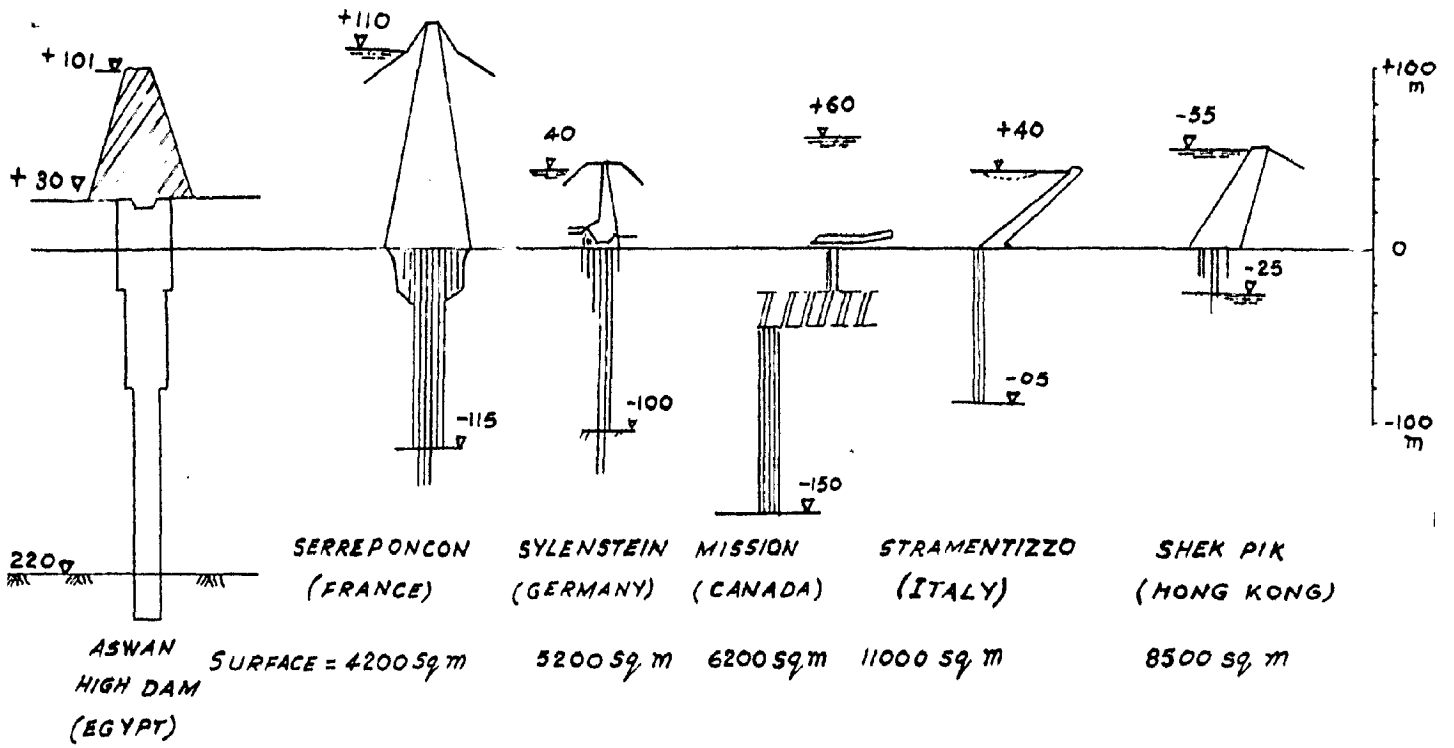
SHOWING GROUT CURTAIN IN ALLUVIAL SOIL FOR DAM FOUNDATIONS
